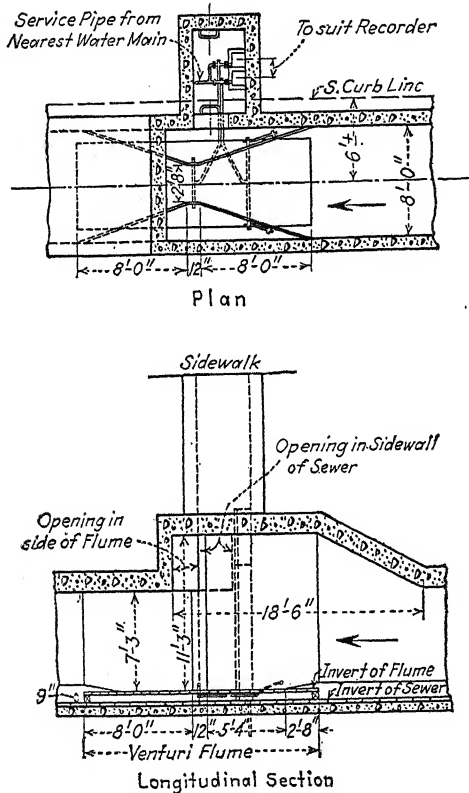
Venturi flume inserted in East 41st street sewer, Manhattan, New York.
